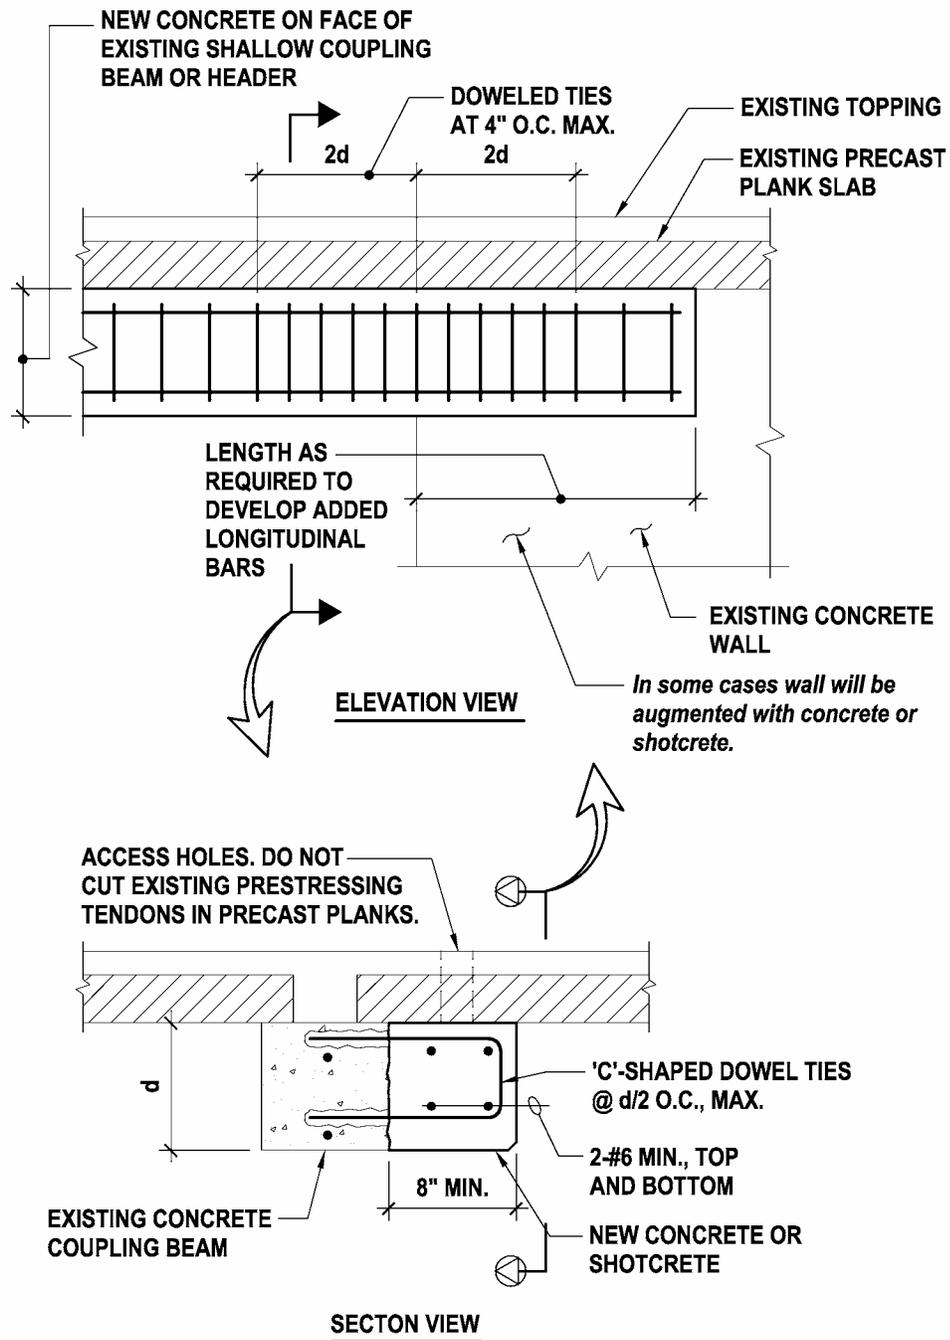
Typical Strengthening of Shallow Coupling Beam
